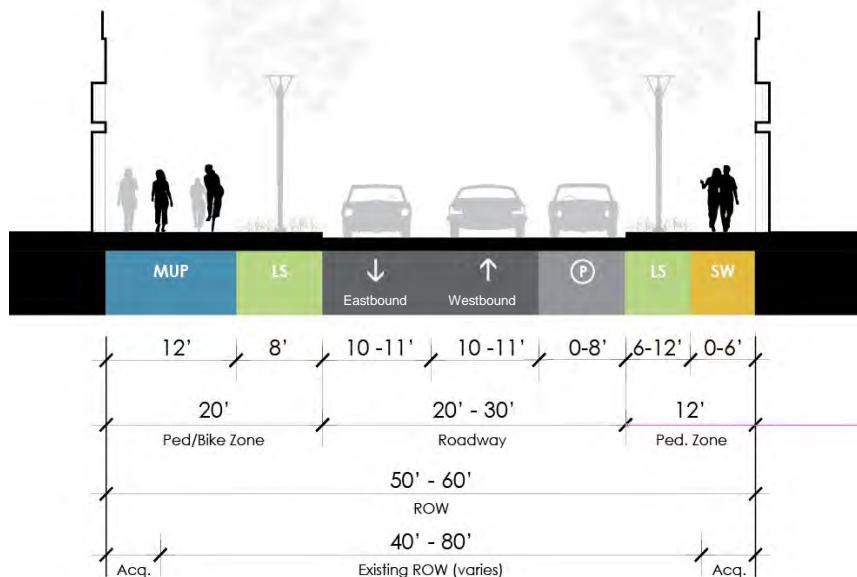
Retail Street Illustration 20th St NE (View Looking East to Main Street)
